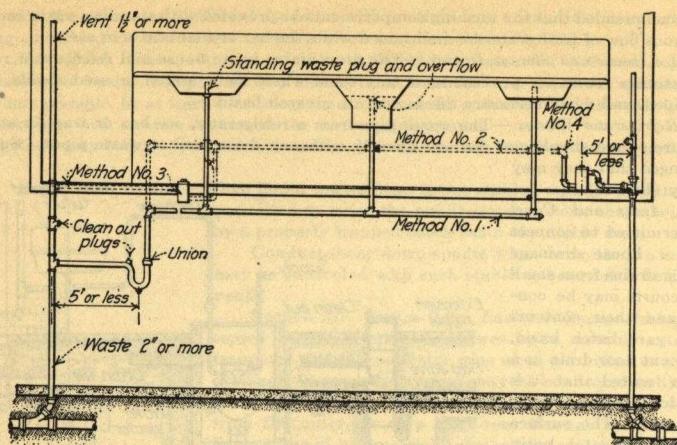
Recommended methods of connecting soda fountain wastes.
